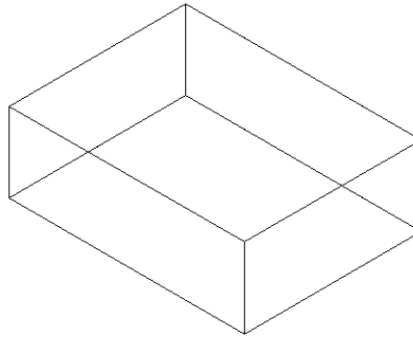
Base Building Geometry - Isometric View of Southeast Corner
